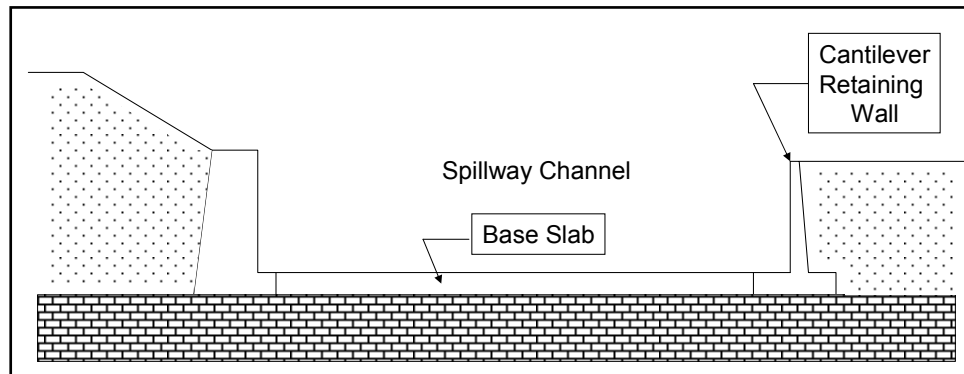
Rock-founded cantilever retaining wall bordering a spillway channel.
